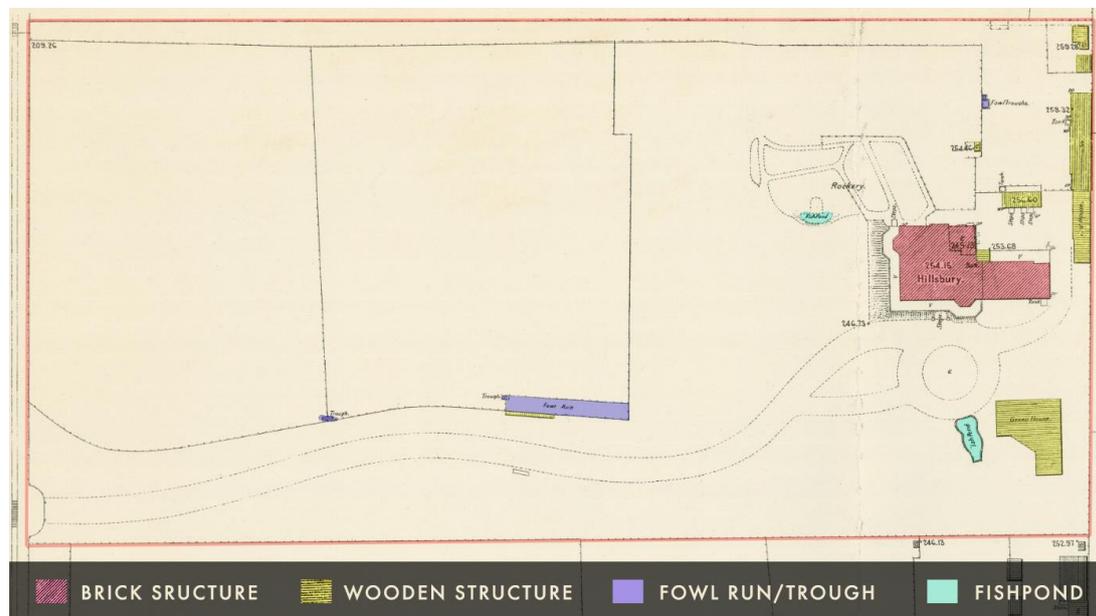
A section of MMBW plan showing the setting of 'Hillsbury' (MMBW Detailed Plan No 1607, 1913).
